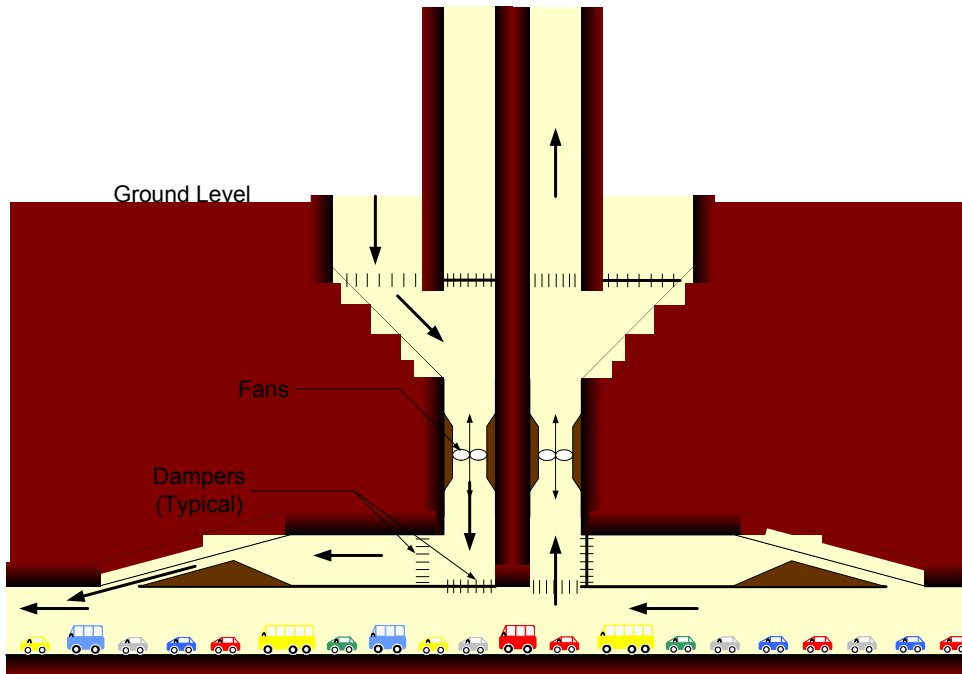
Example of a Mid-Tunnel Ventilation Arrangement for Longitudinal Ventilation using a Saccardo Nozzle
